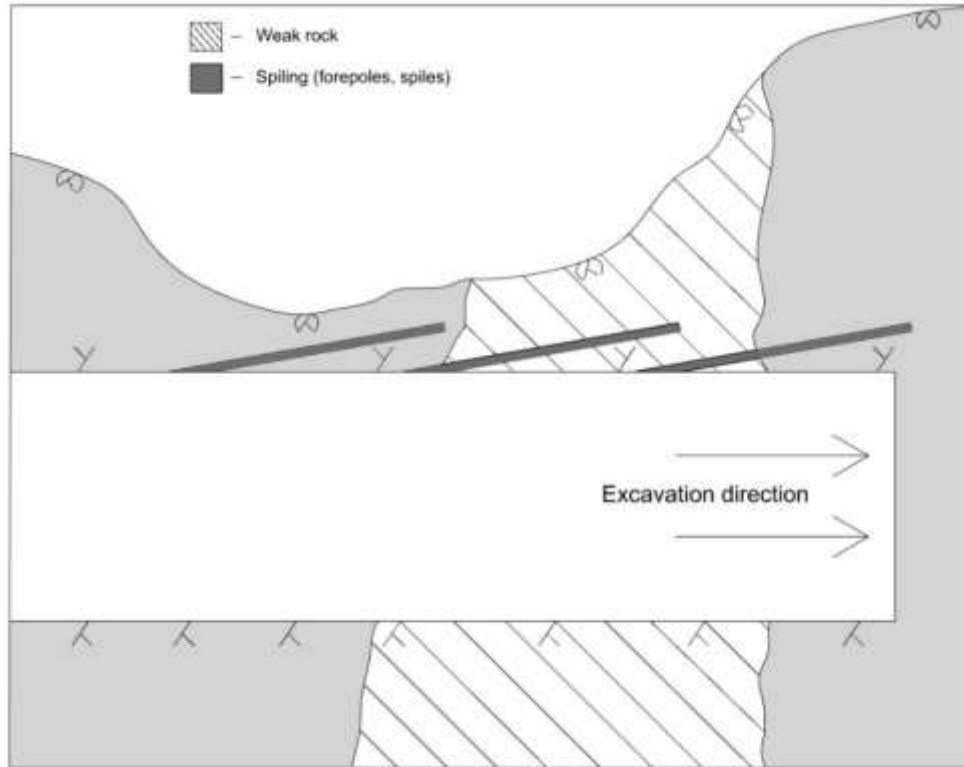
Example of a longitudinal section for a tunnel with spiling in weak rock and low rock cover.
